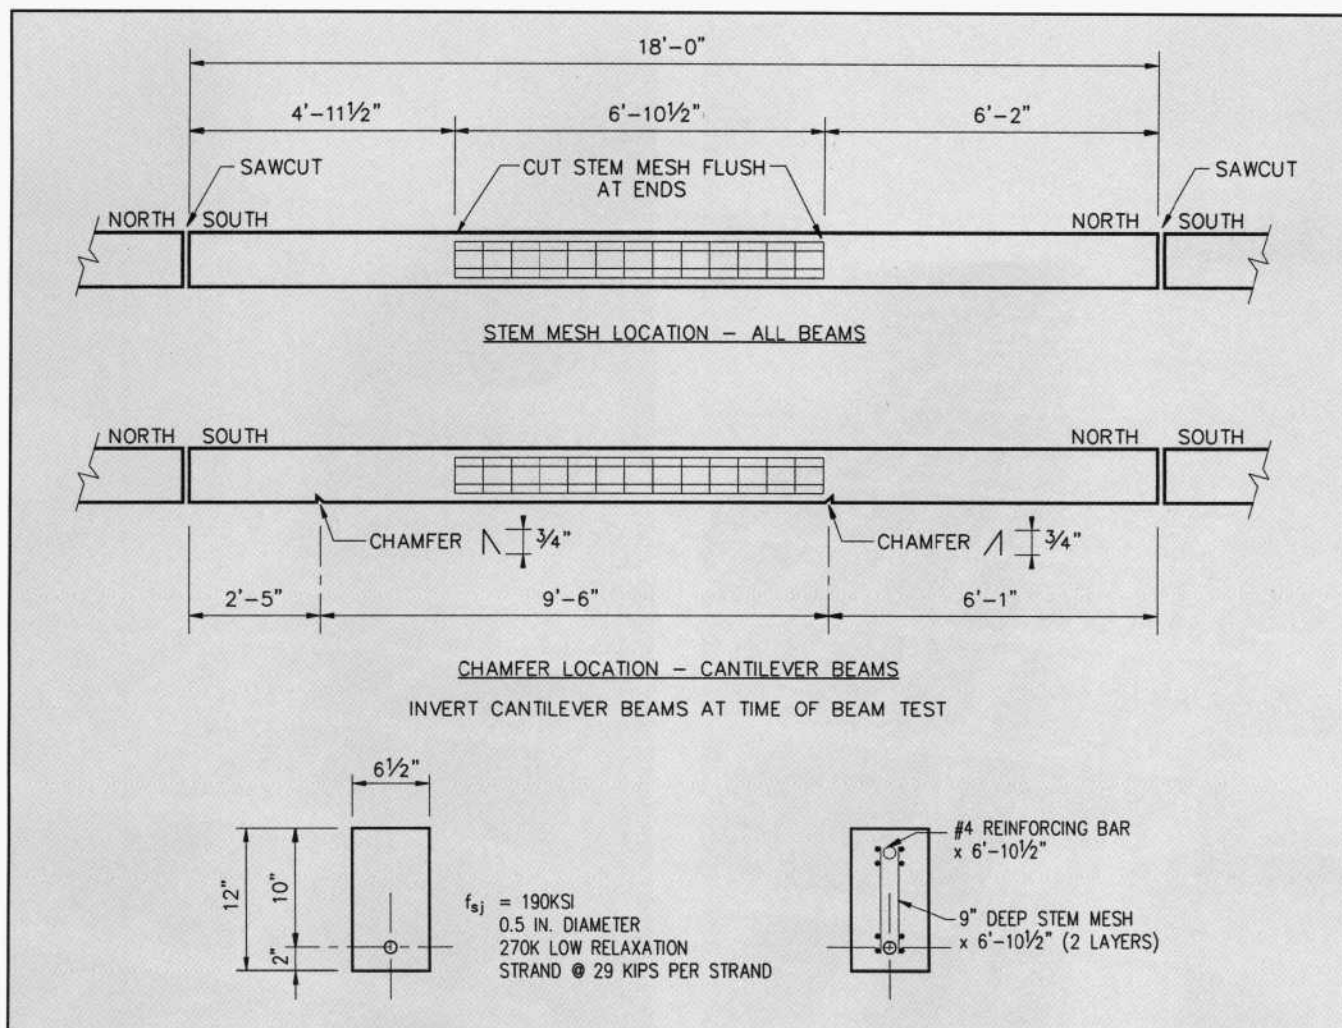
Beam cross section, reinforcement and saw-cut locations.
